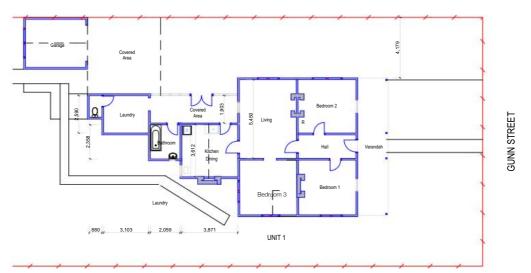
Existing Floor Plan. Source: The writer/ carste STUDIO
